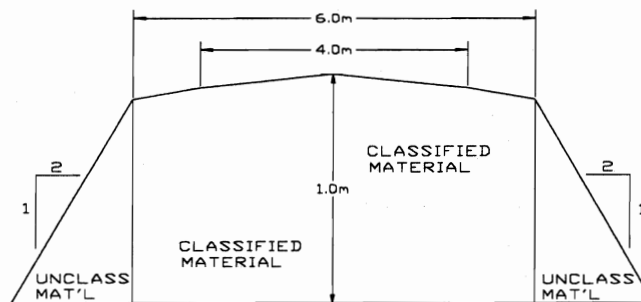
Proposed cross section of road from Singauk Entrance to Igrugaivik.
